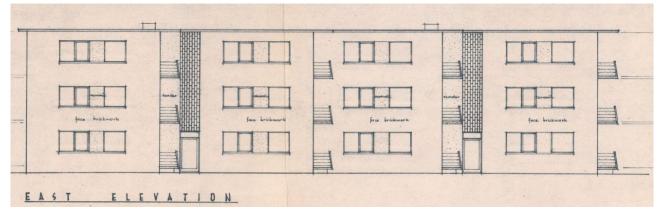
East elevation, Shirley Grove (Source: Council Building File)
